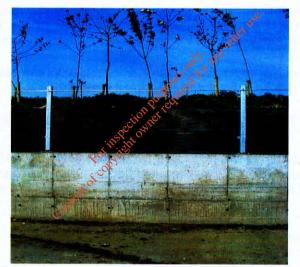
Wall and Earthen Boundary Surrounding the Composting Slab
